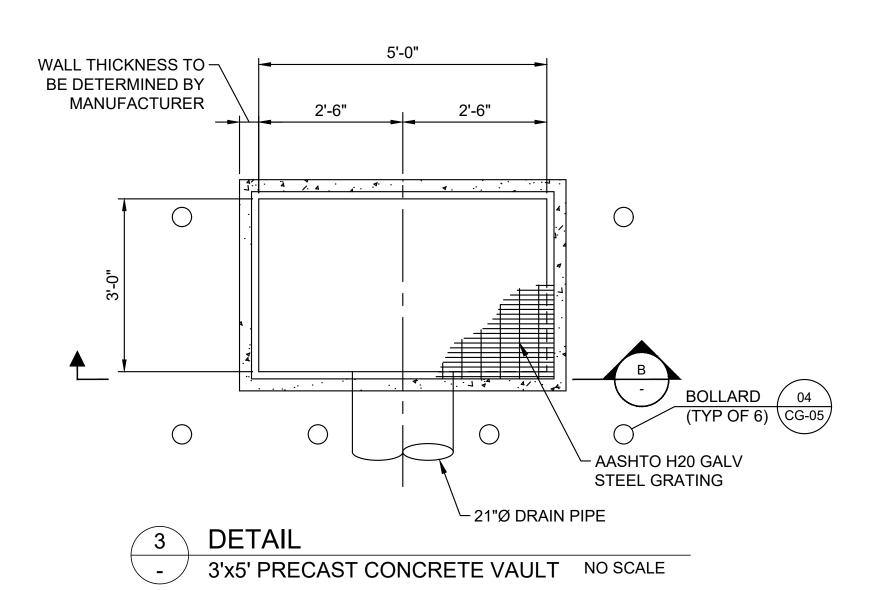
DETAIL SQUARE PRECAST CONCRETE VAULT NO SCALE
